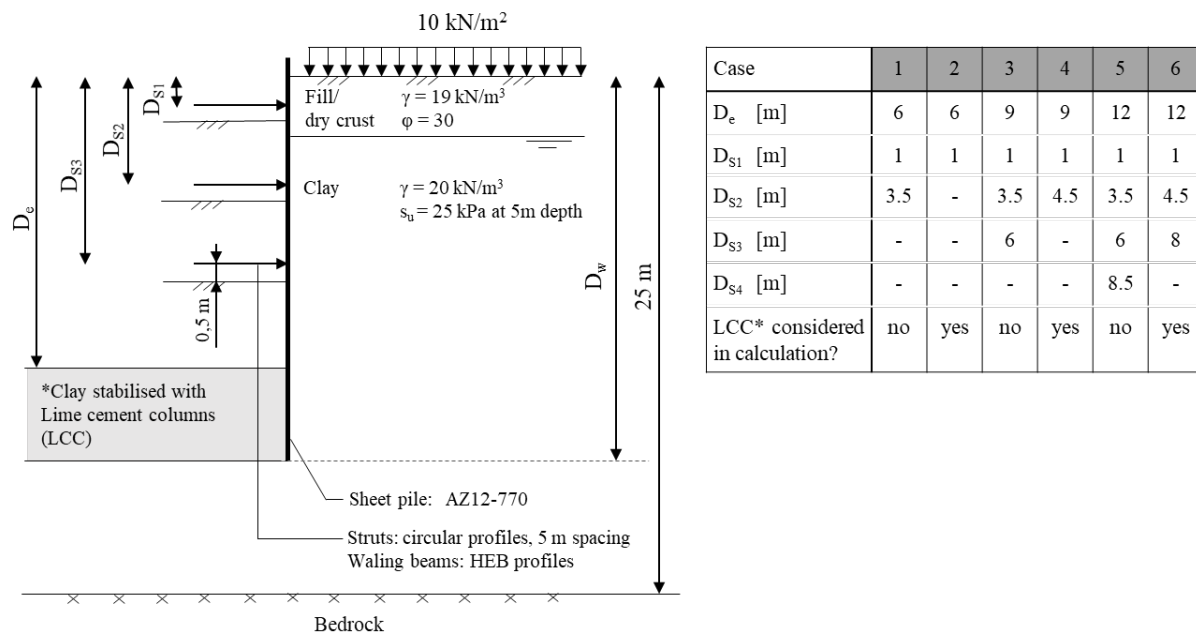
Excavation scenario and list of cases. The excavation depth, D_e , the length of the retaining wall, D_w , and the number and stiffness of struts are varied depending on the case. The soil inside of the sheet pile wall is only stabilised for some of the cases.
